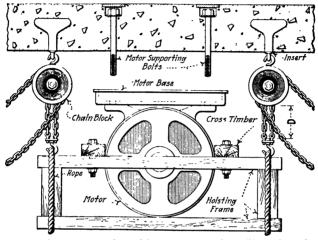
Arrangement for raising motors to the ceiling when threaded sockets are provided. Care must be exercised to insure that the distance D will be sufficient, after the motor has been raised to position, to insure that the anchor bolts will pass through the bedplate so that the nuts may be turned on. (H. Winfield Secon.)
